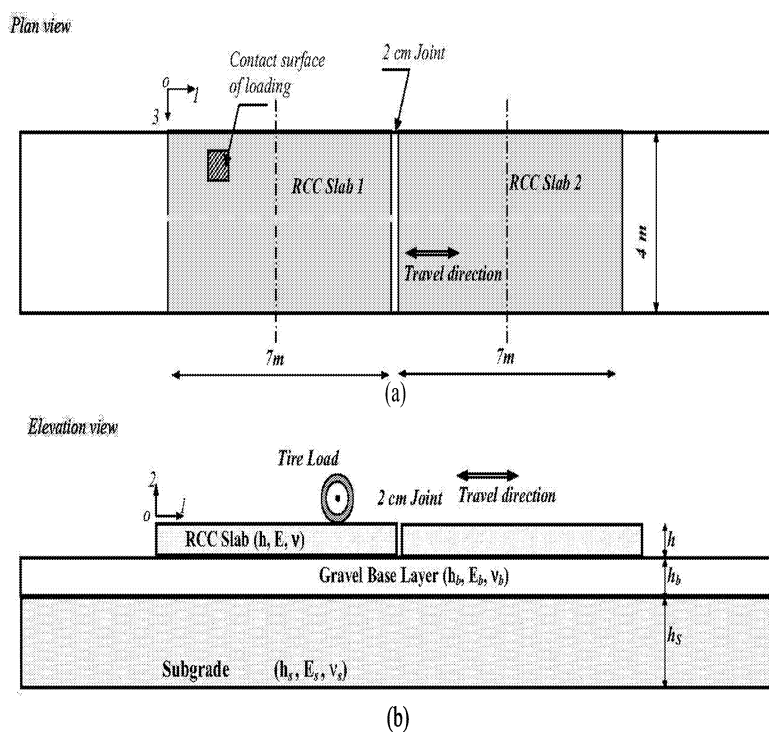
Model Adopted for the RCC (a) Plan and (b) Elevation View.
